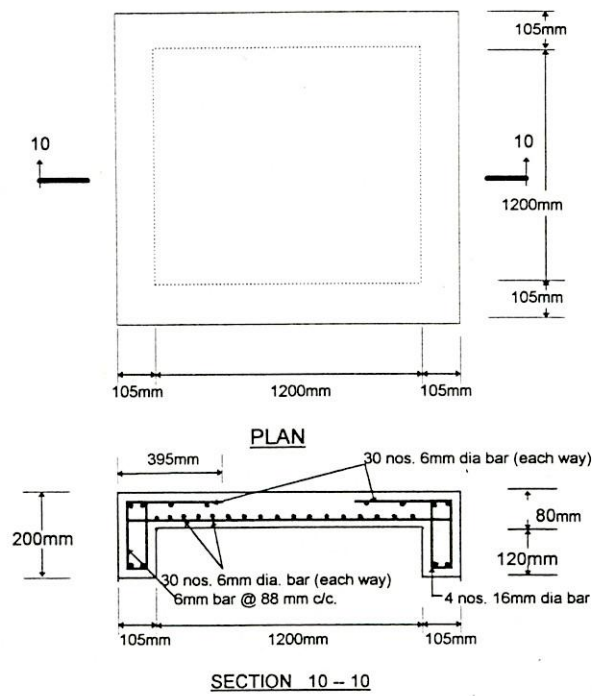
(a) Plan (b) Section and reinforcement details of SLAB10
